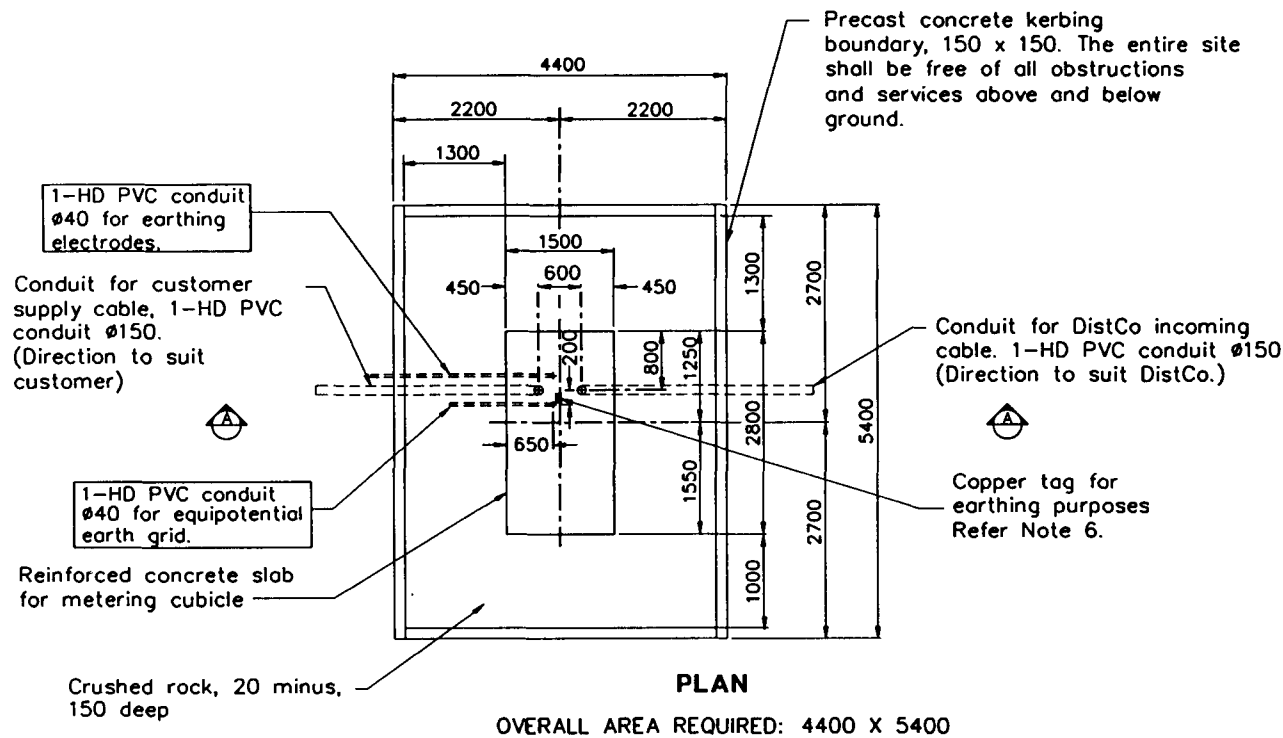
H.V. Metering Structure – Foundation and Support Details for Meter Box
